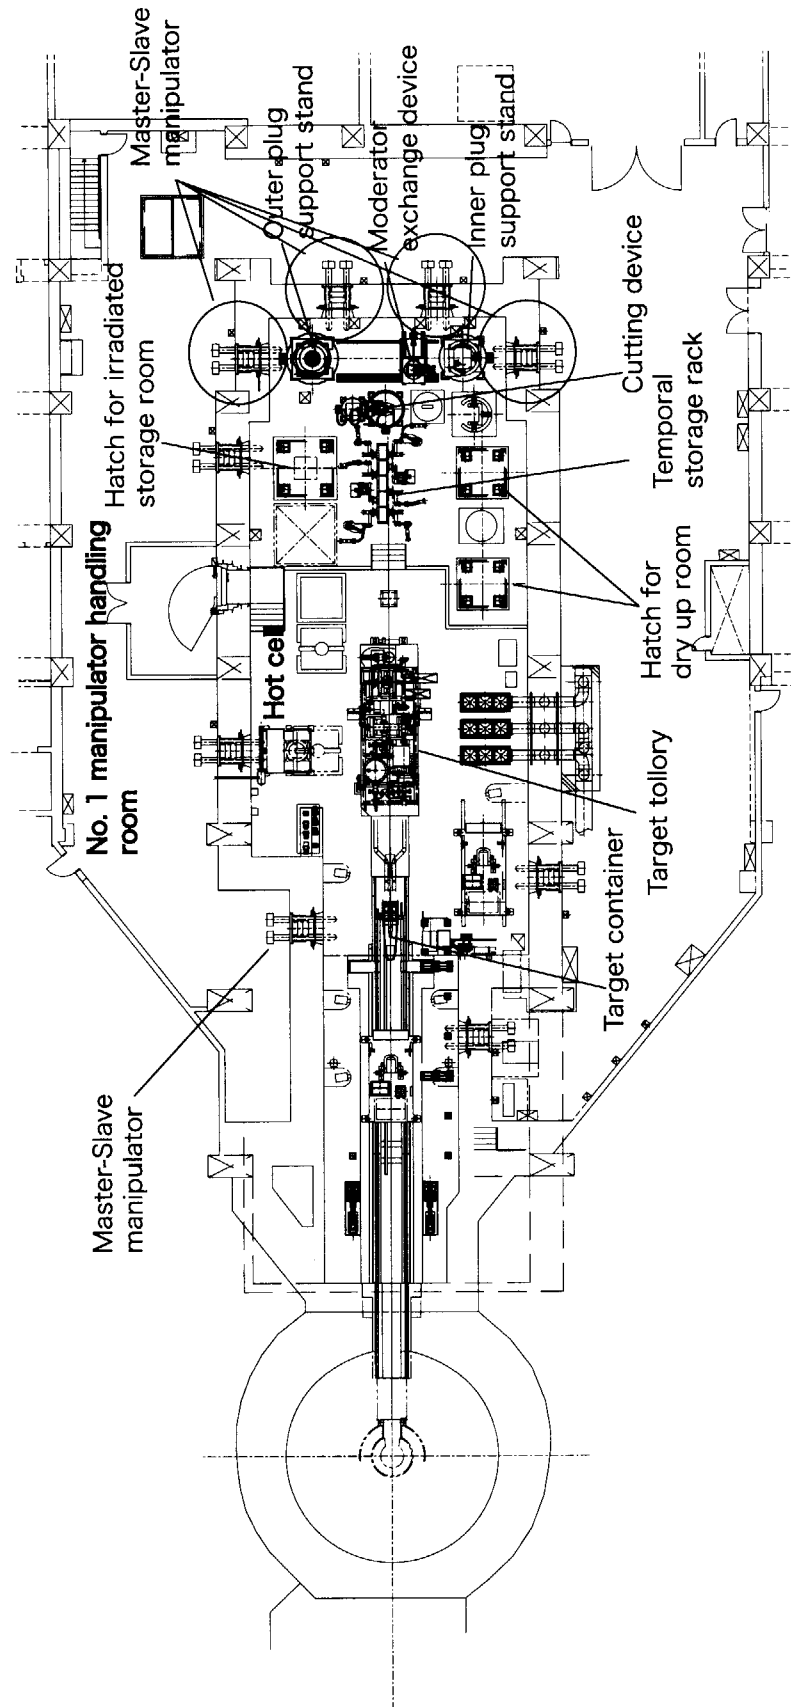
Horizontal cross sectional view of 1st floor of MLF.
